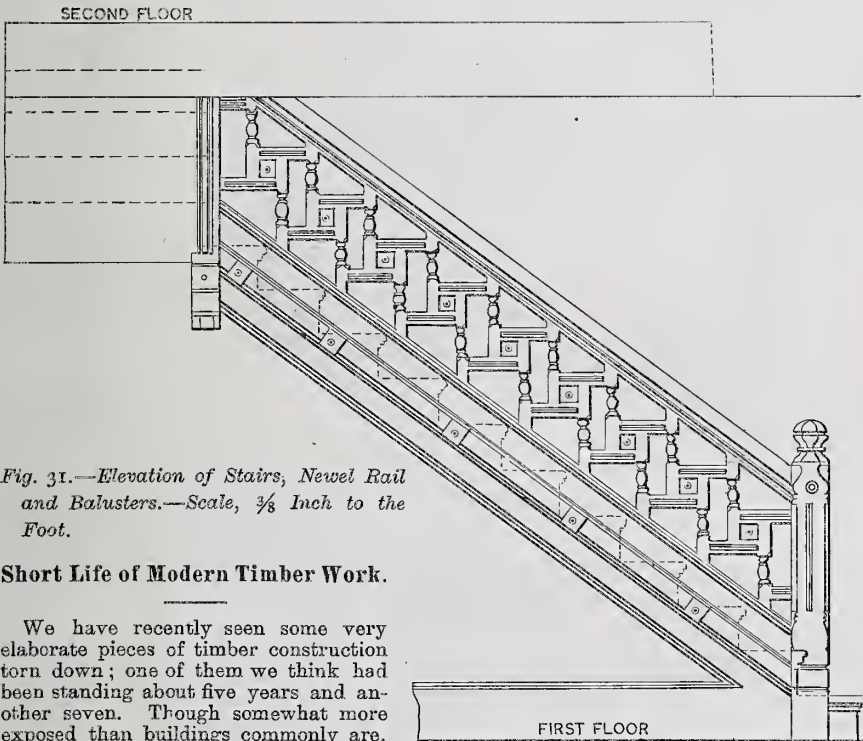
Elevation of Stairs, Newel Rail and Balusters.—Scale, $\frac{3}{8}$ Inch to the Foot.
